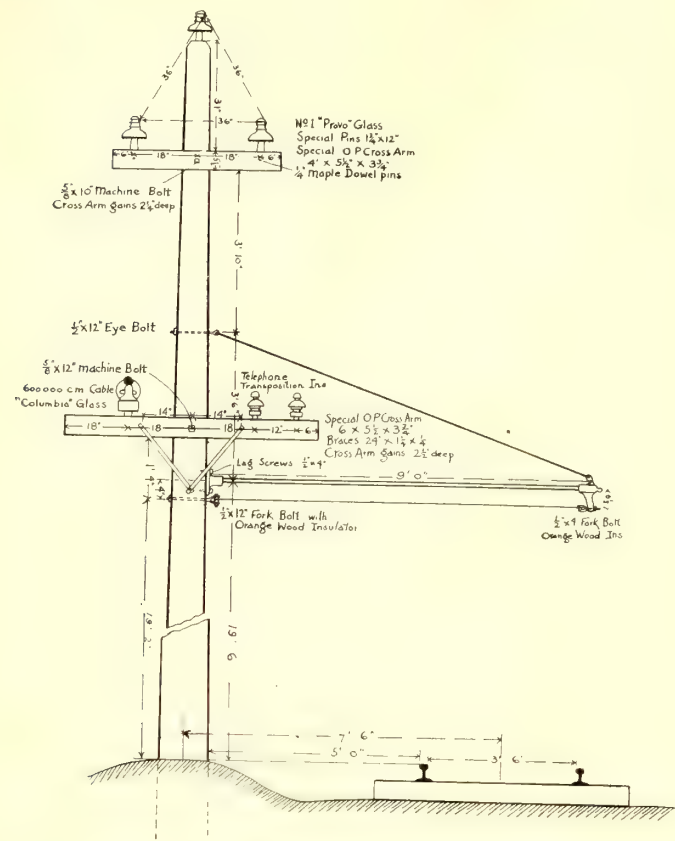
ARRANGEMENT OF OVERHEAD CONSTRUCTION
